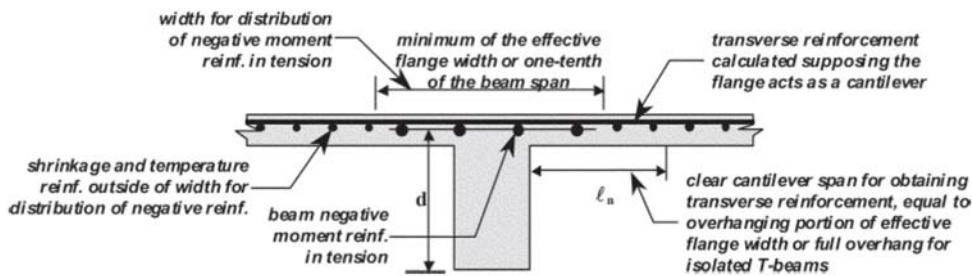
Reinforcement in T-beam flanges.
